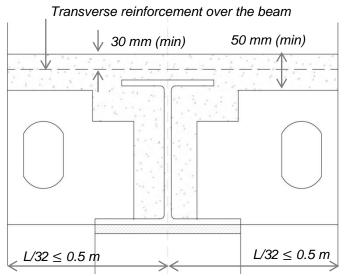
Limited composite action between ASB and precast hollow core slab
